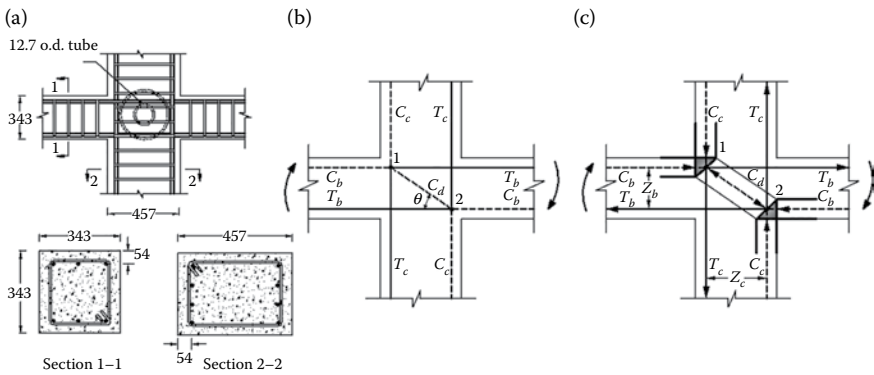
Example 7.4—an interior beam–column connection: (a) connection, (b) *STM*, and (c) *STM* details.
